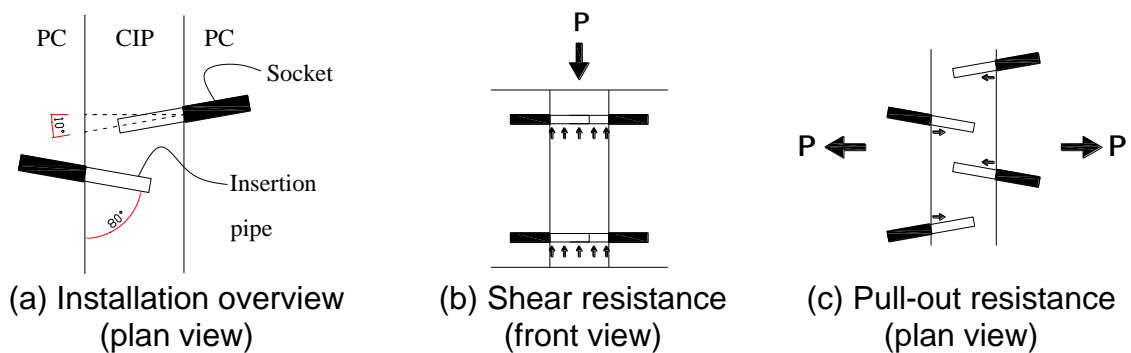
Installation overview and mechanical characteristics of pipe connectors
